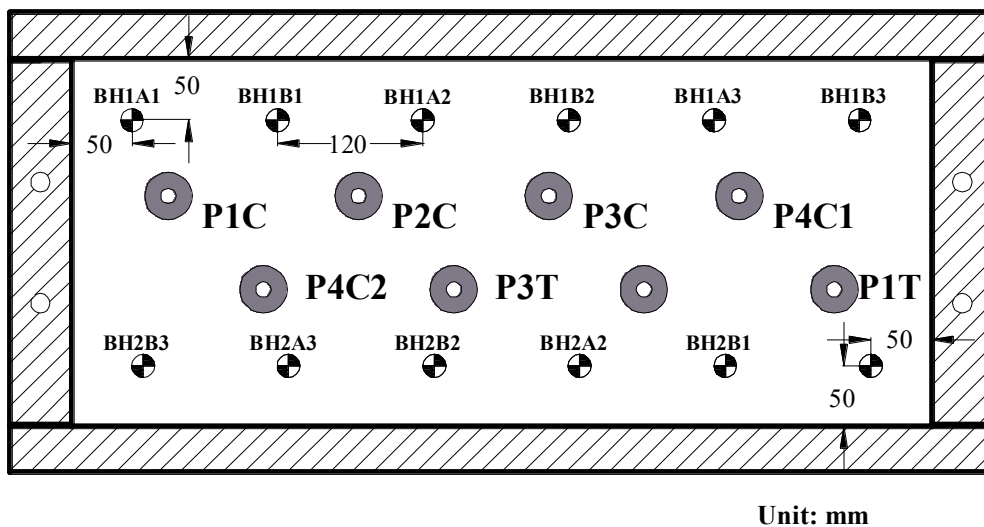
Layout of vane shear test (e.g., BH1A1) and model piles
